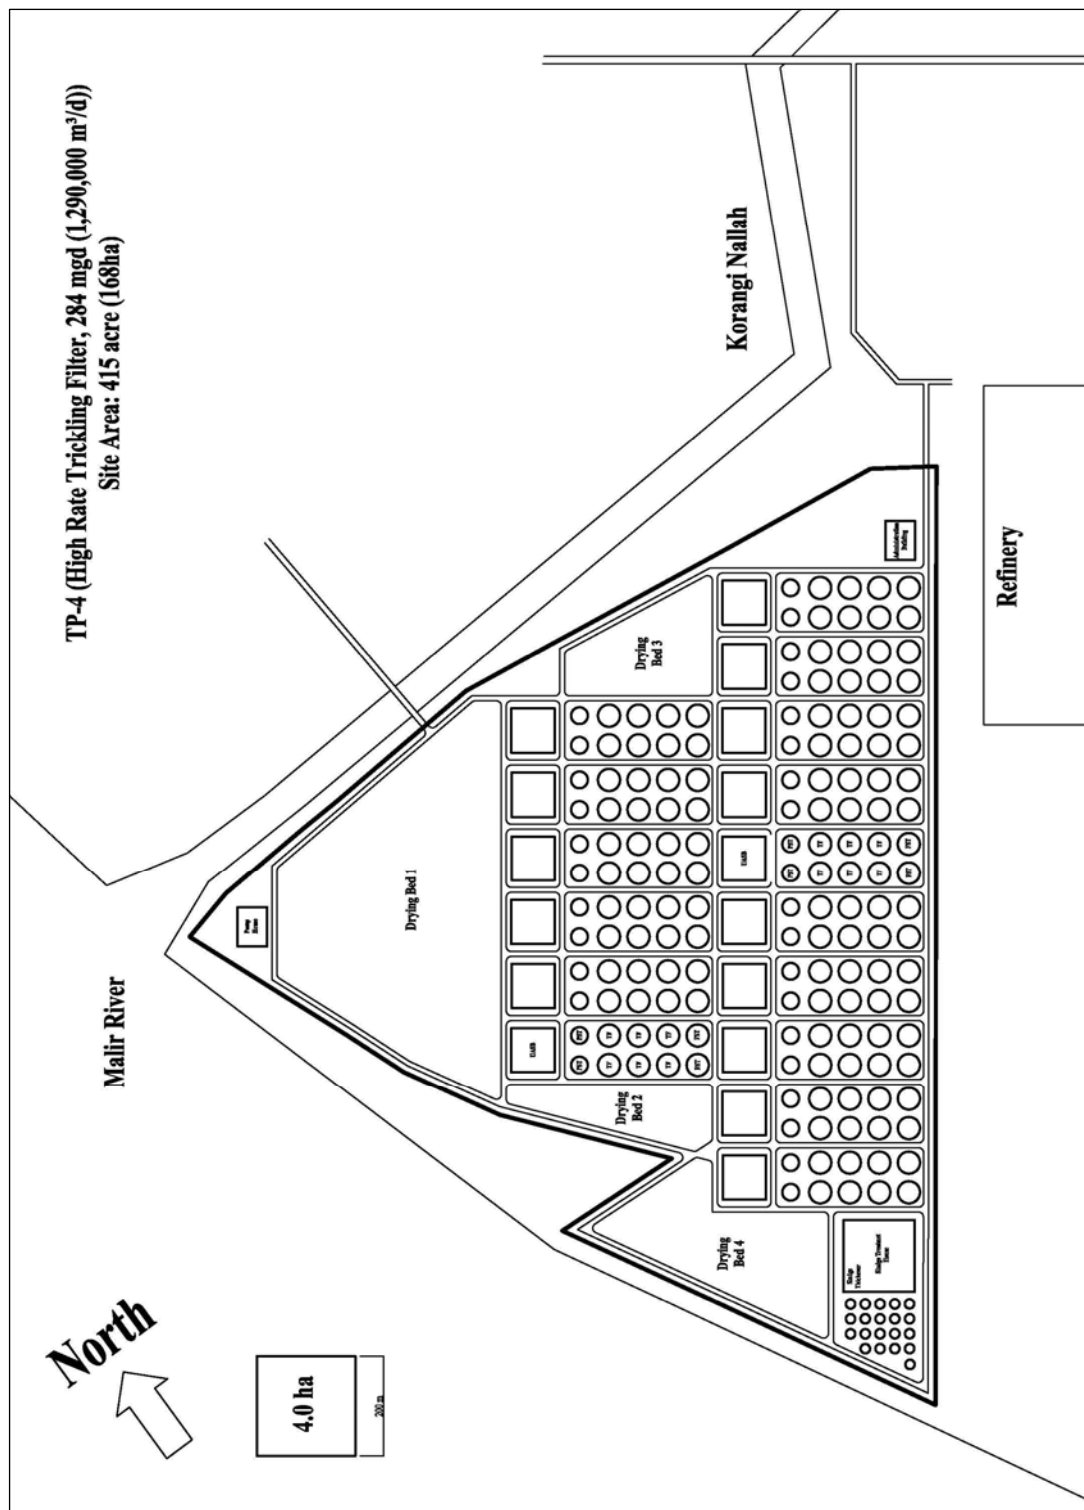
General Plan of Sewage Treatment Plant TP-4
